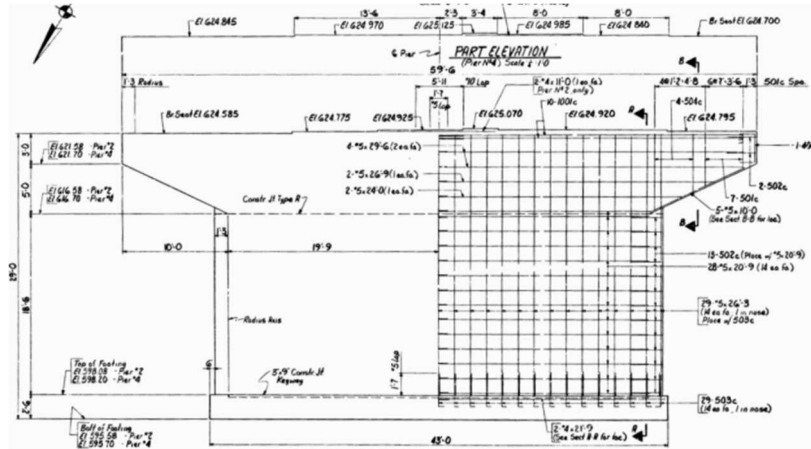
Transverse Elevation of an Interior Pier of Bridge (NBI 19430) (1982)
